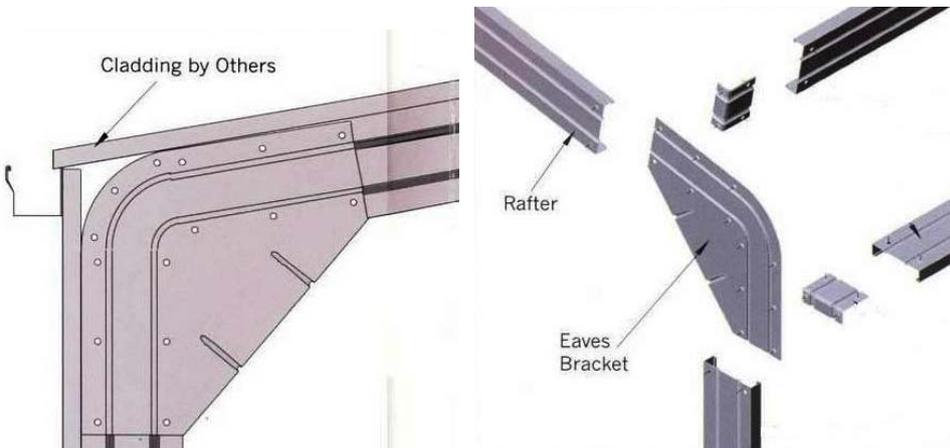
(left) Eaves connection stiffener. Figure 61: (right) Exploded view of eaves connection system and stiffener plate
